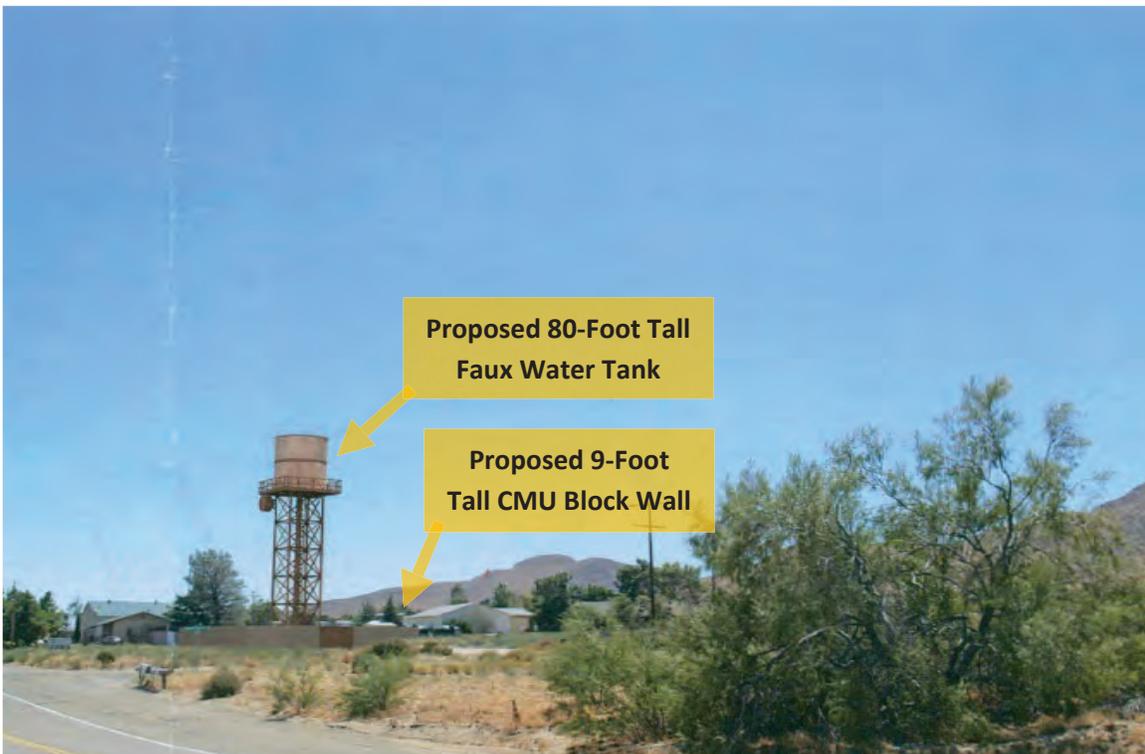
View of the Project looking south from Great Southern Overland Stage Route.
